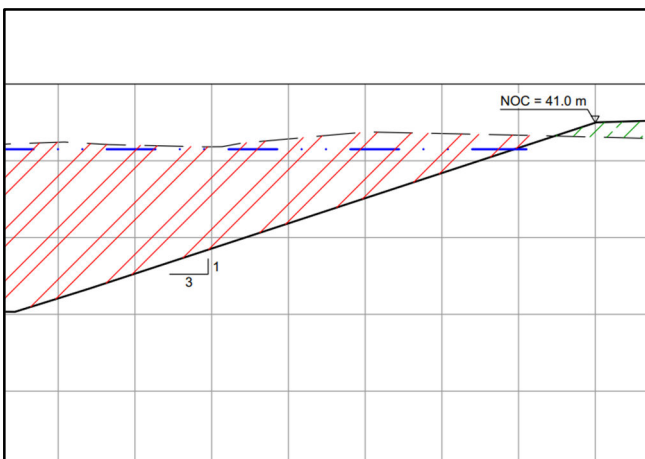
Dam at the 5th tees typical details of the earth embankment
